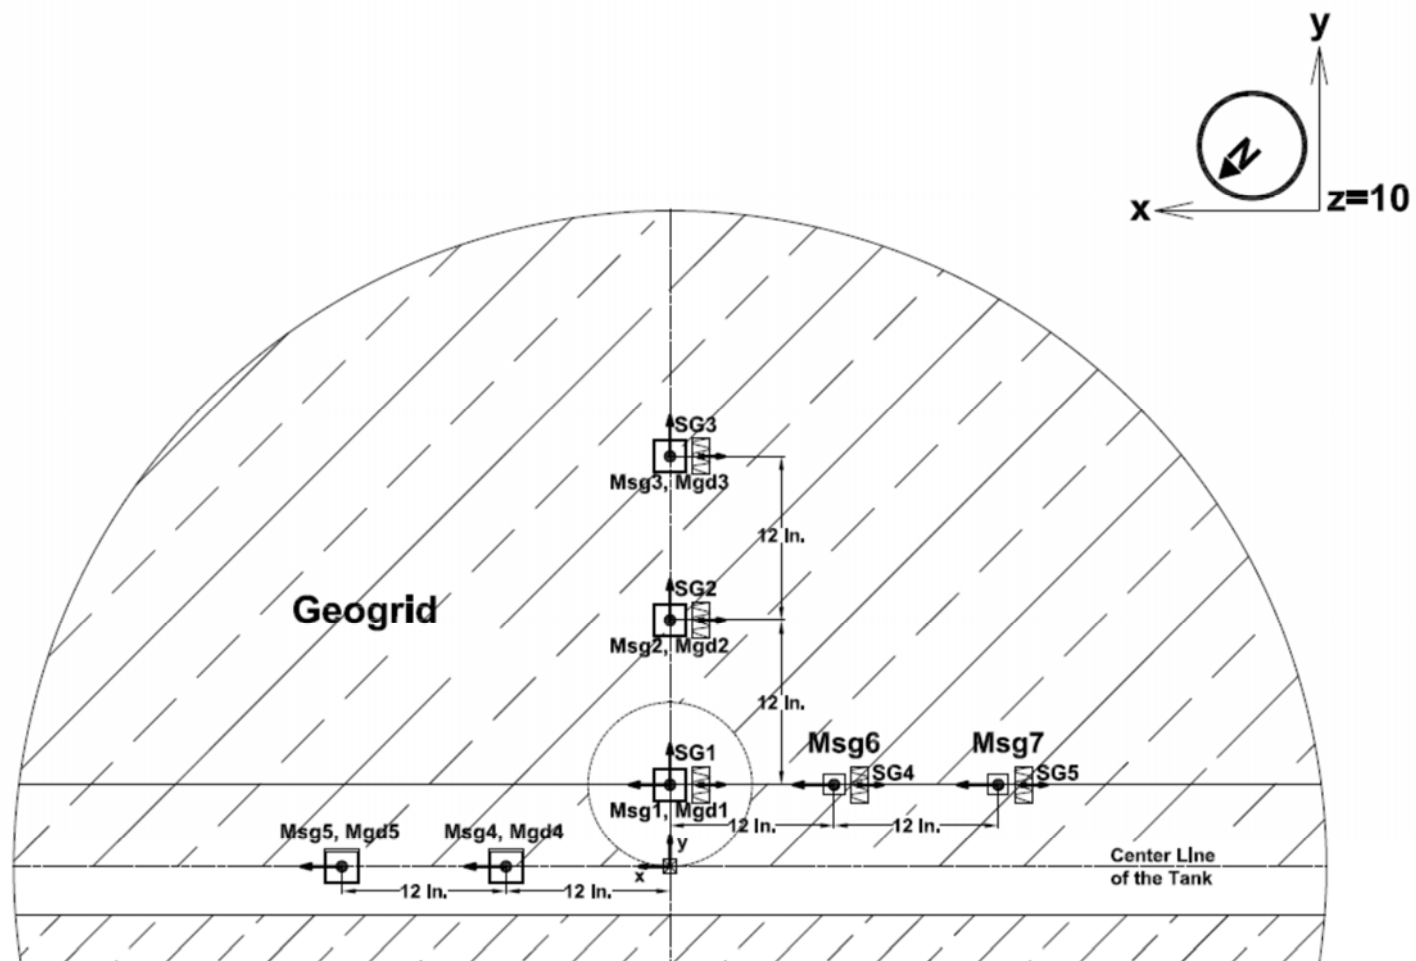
Instrumentation plan for experiment No. 9—Plan view, Z=10 inches
